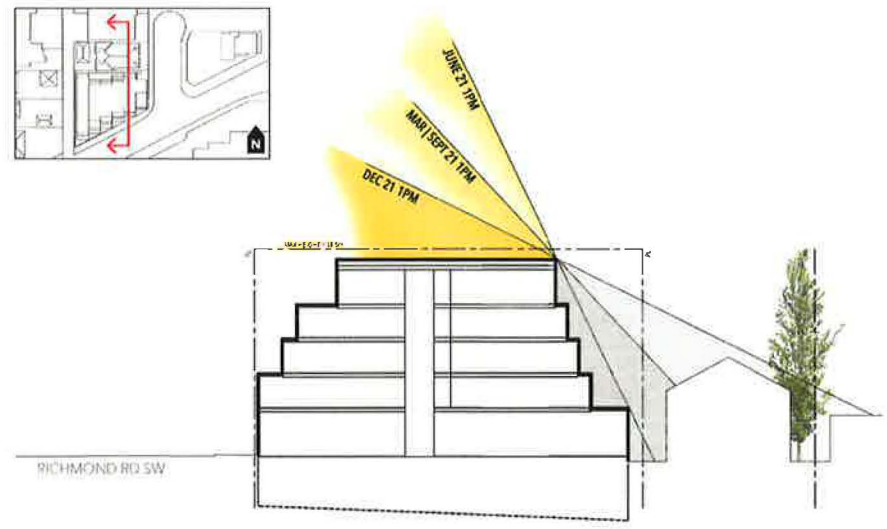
NORTH-SOUTH SECTION (LOOKING WEST)
